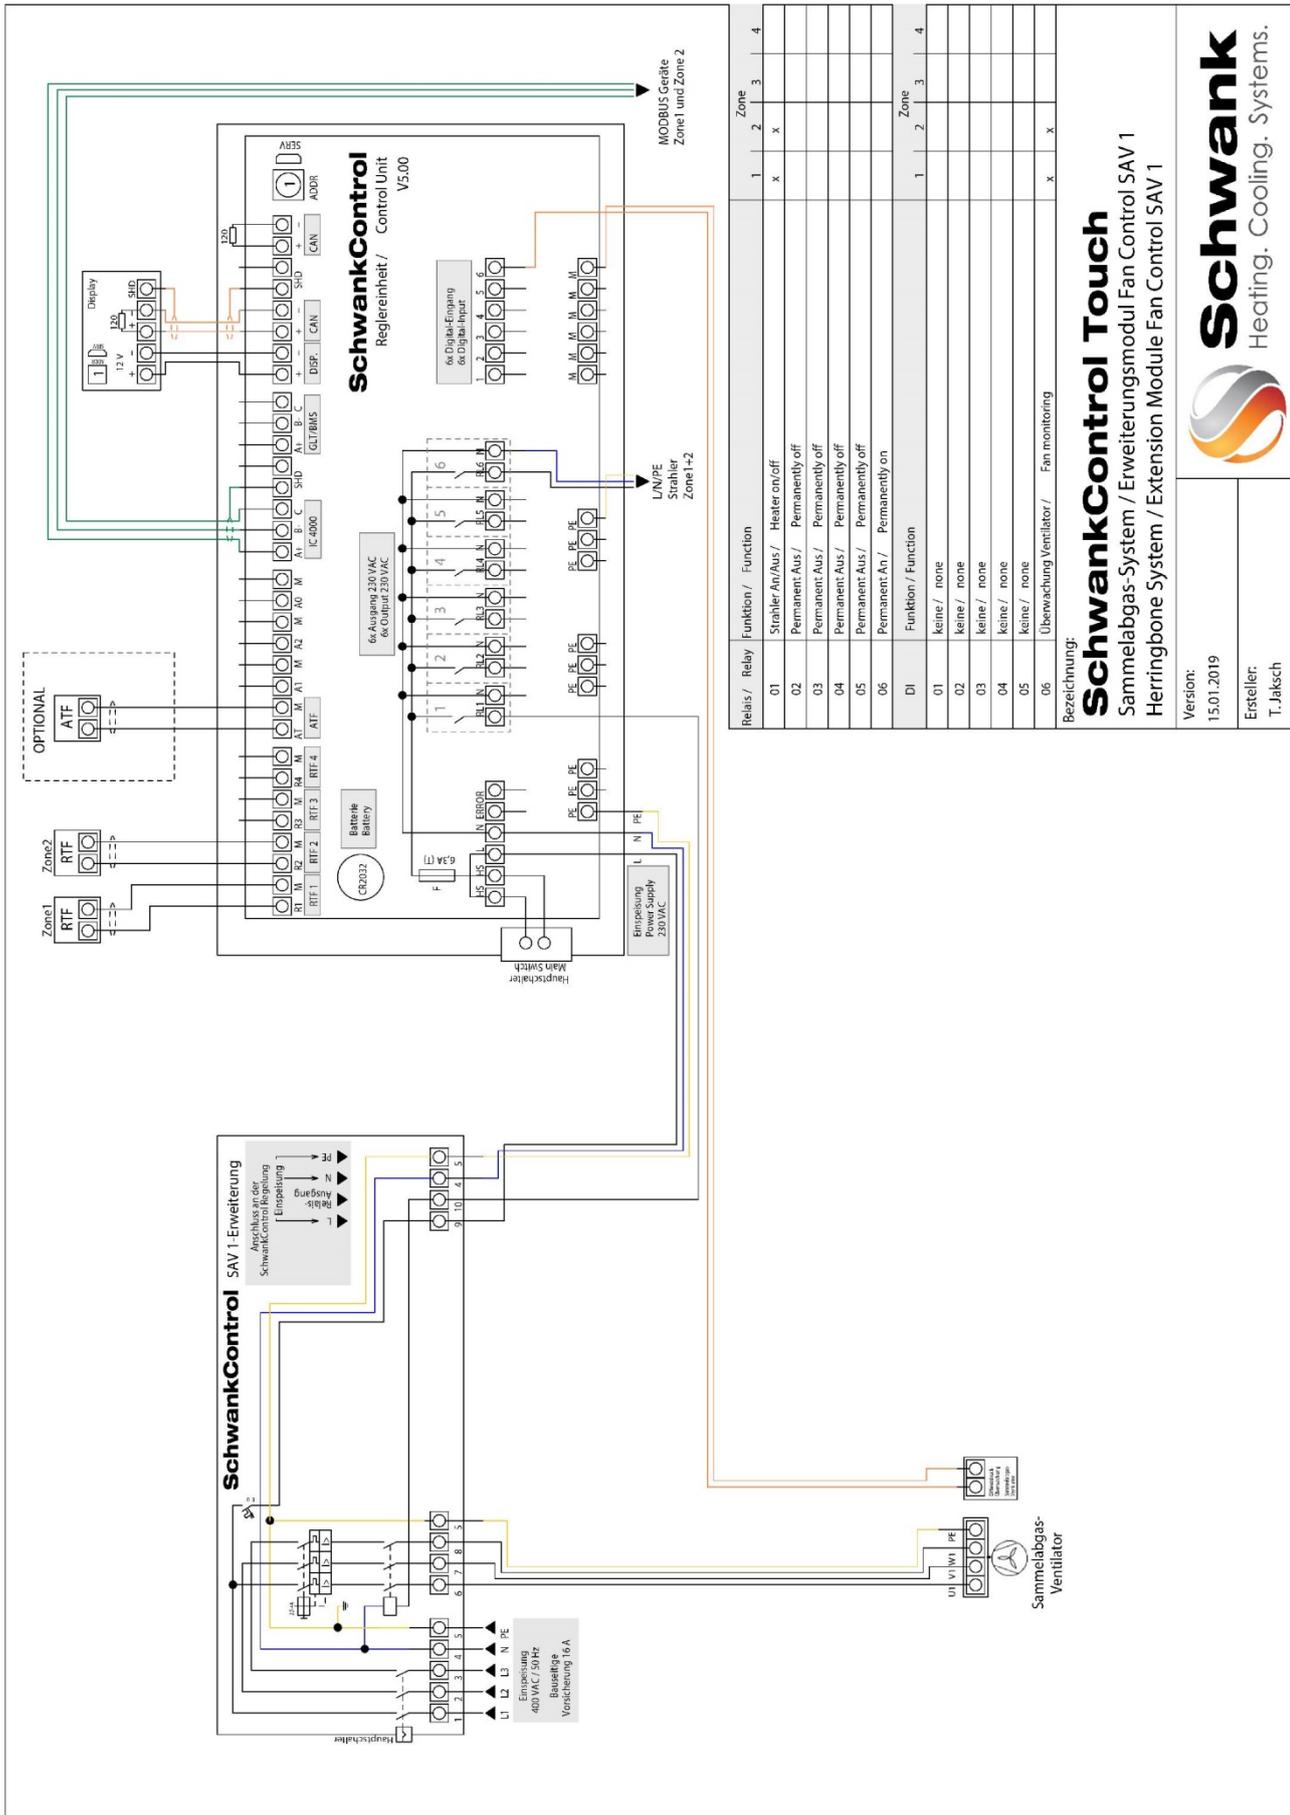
Connection scheme bluTek burner kit exhaust collecting system with SchwankControl Touch / Extension kit Fan Control SAV1
